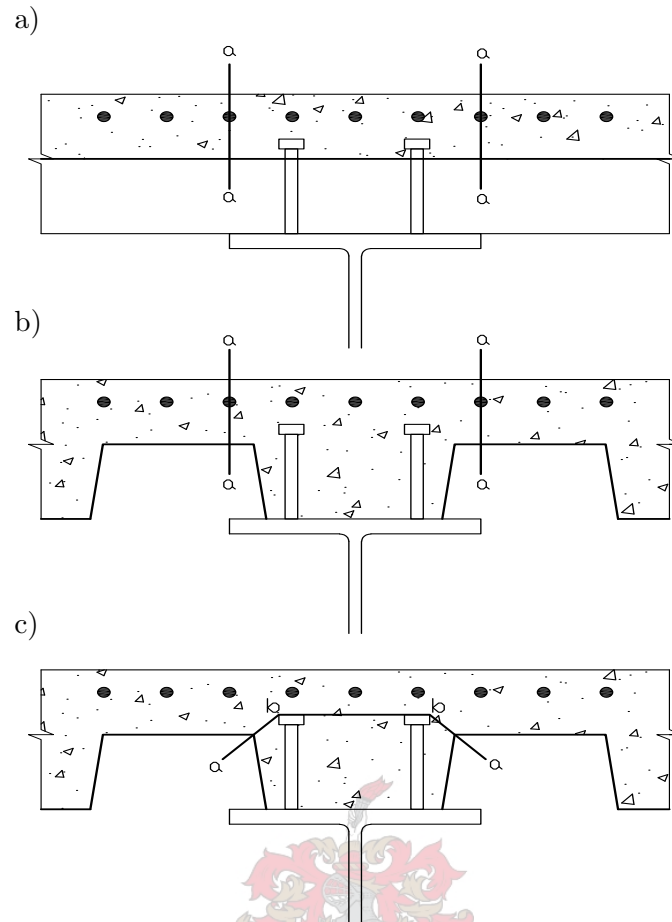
Section through a composite beam with profiled decking showing possible longitudinal shear planes
